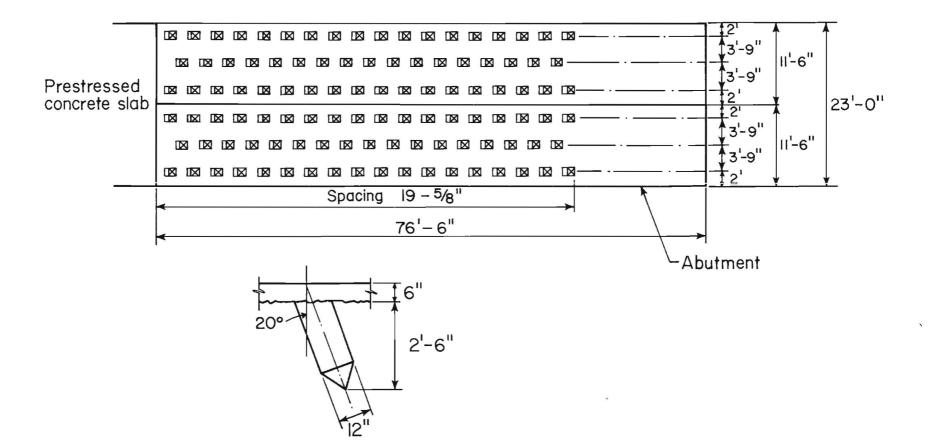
ABUTMENT ON PILES FOR PRESTRESSED PAVEMENT AT ZWARTBERG-MEEUWEN, BELGIUM
